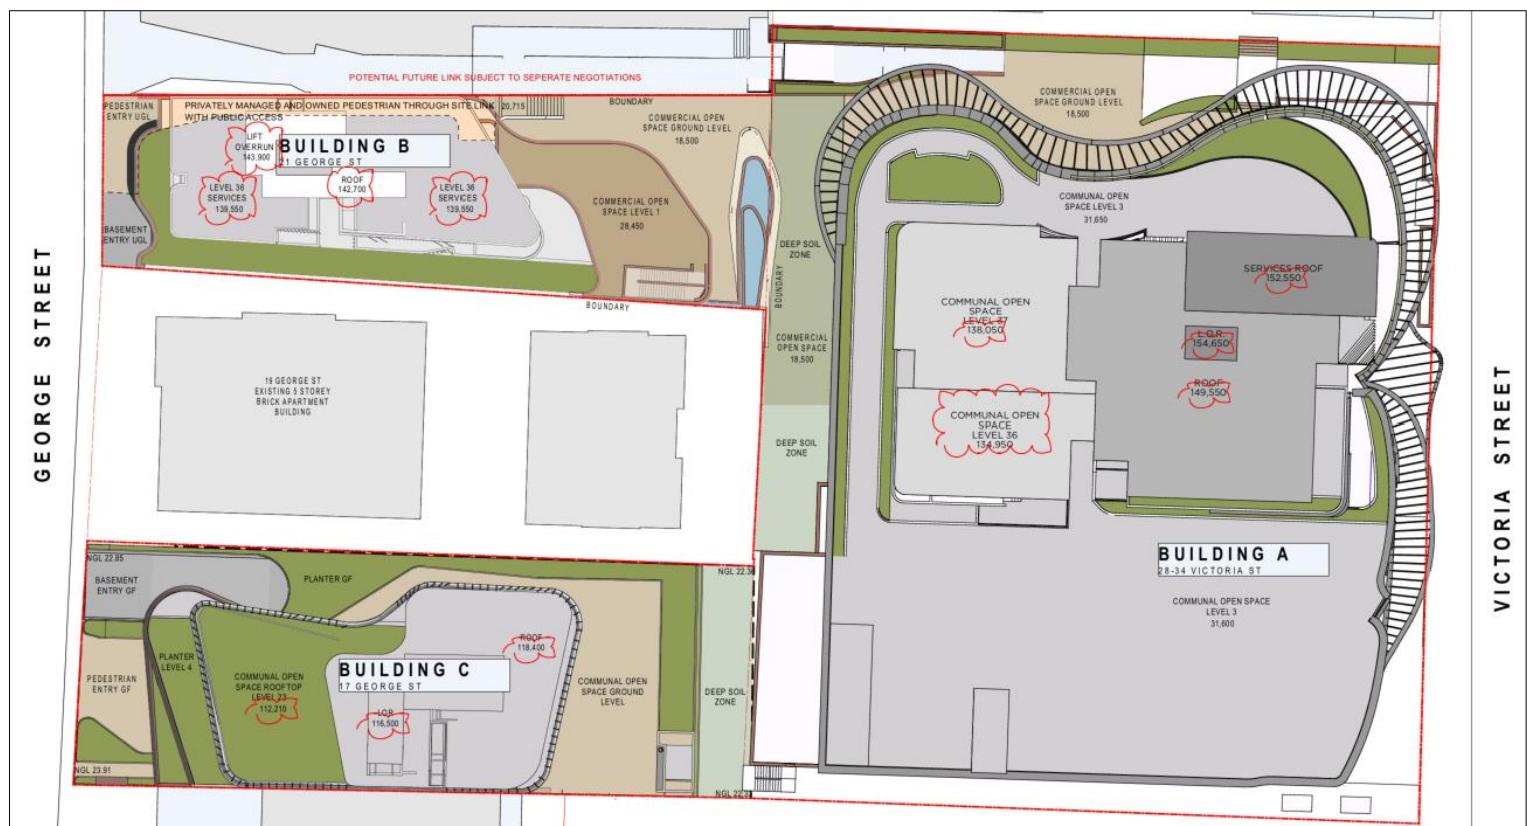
(above) Site Plan provided by the applicant. Source: Urban Link Architects.
